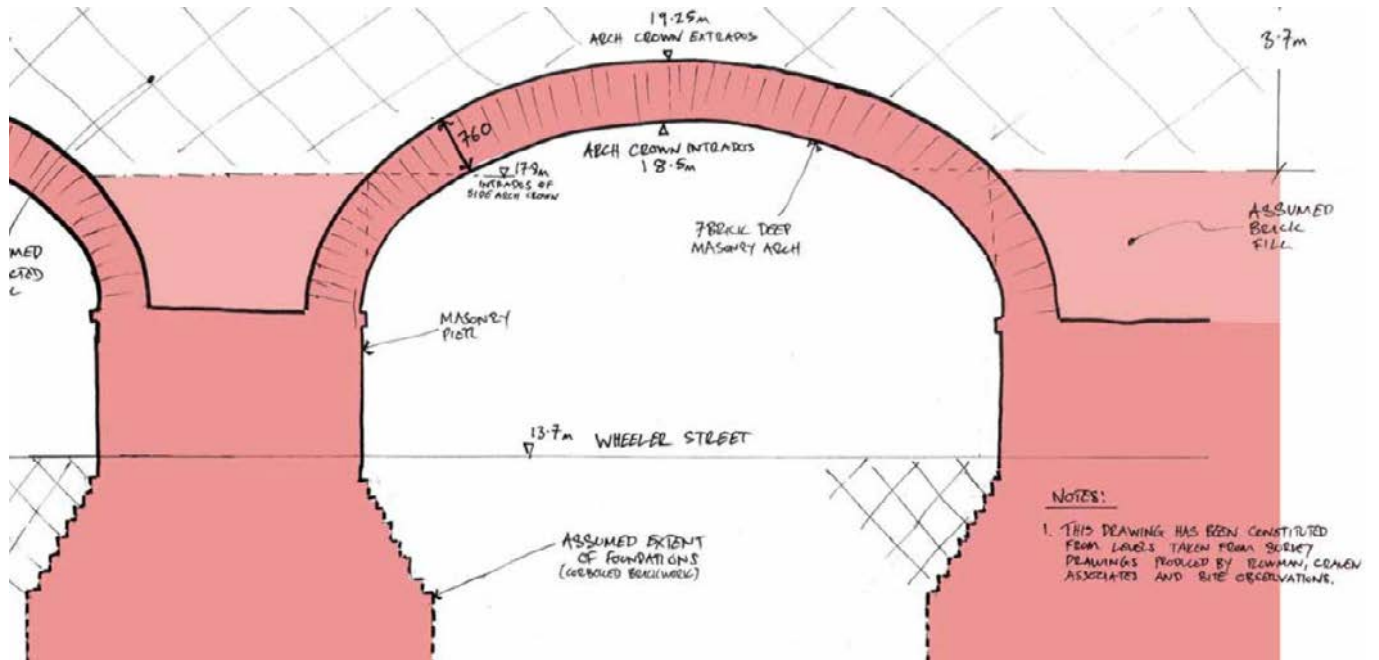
Indicative section through Braithwaite Arch over Wheeler Street
